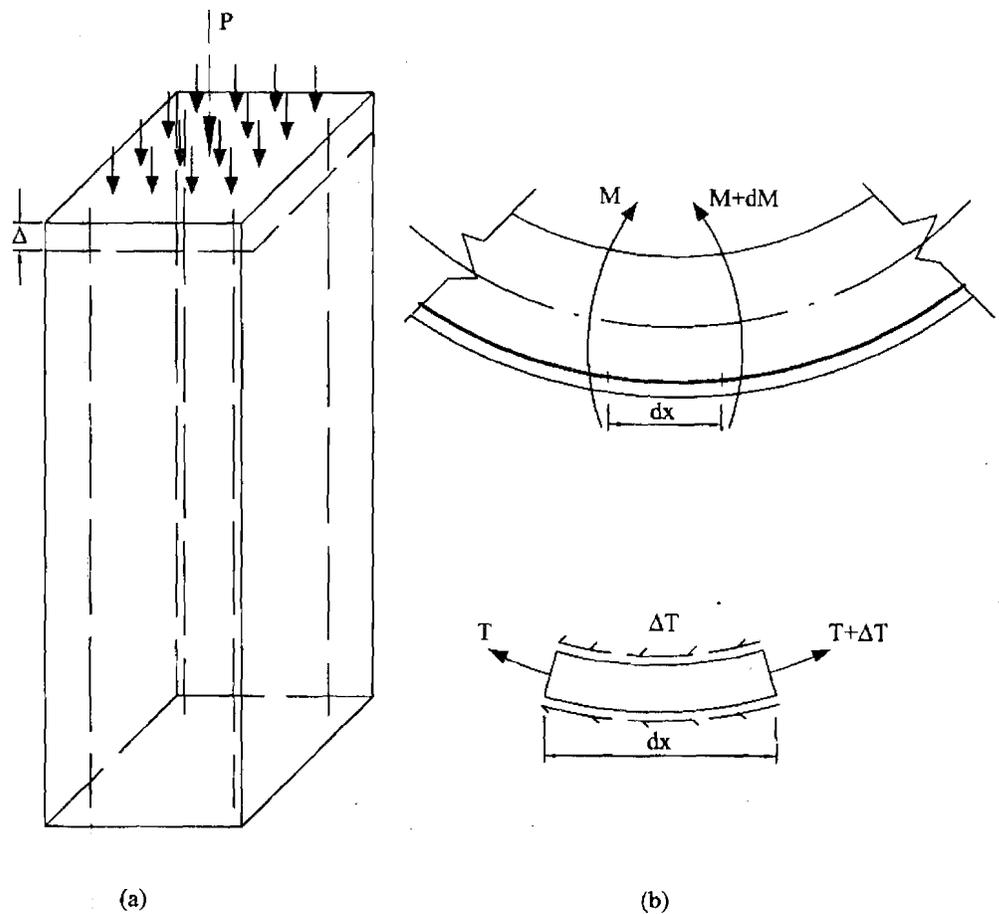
Explaining the Effect of Proper Bond between Concrete and Reinforcement
